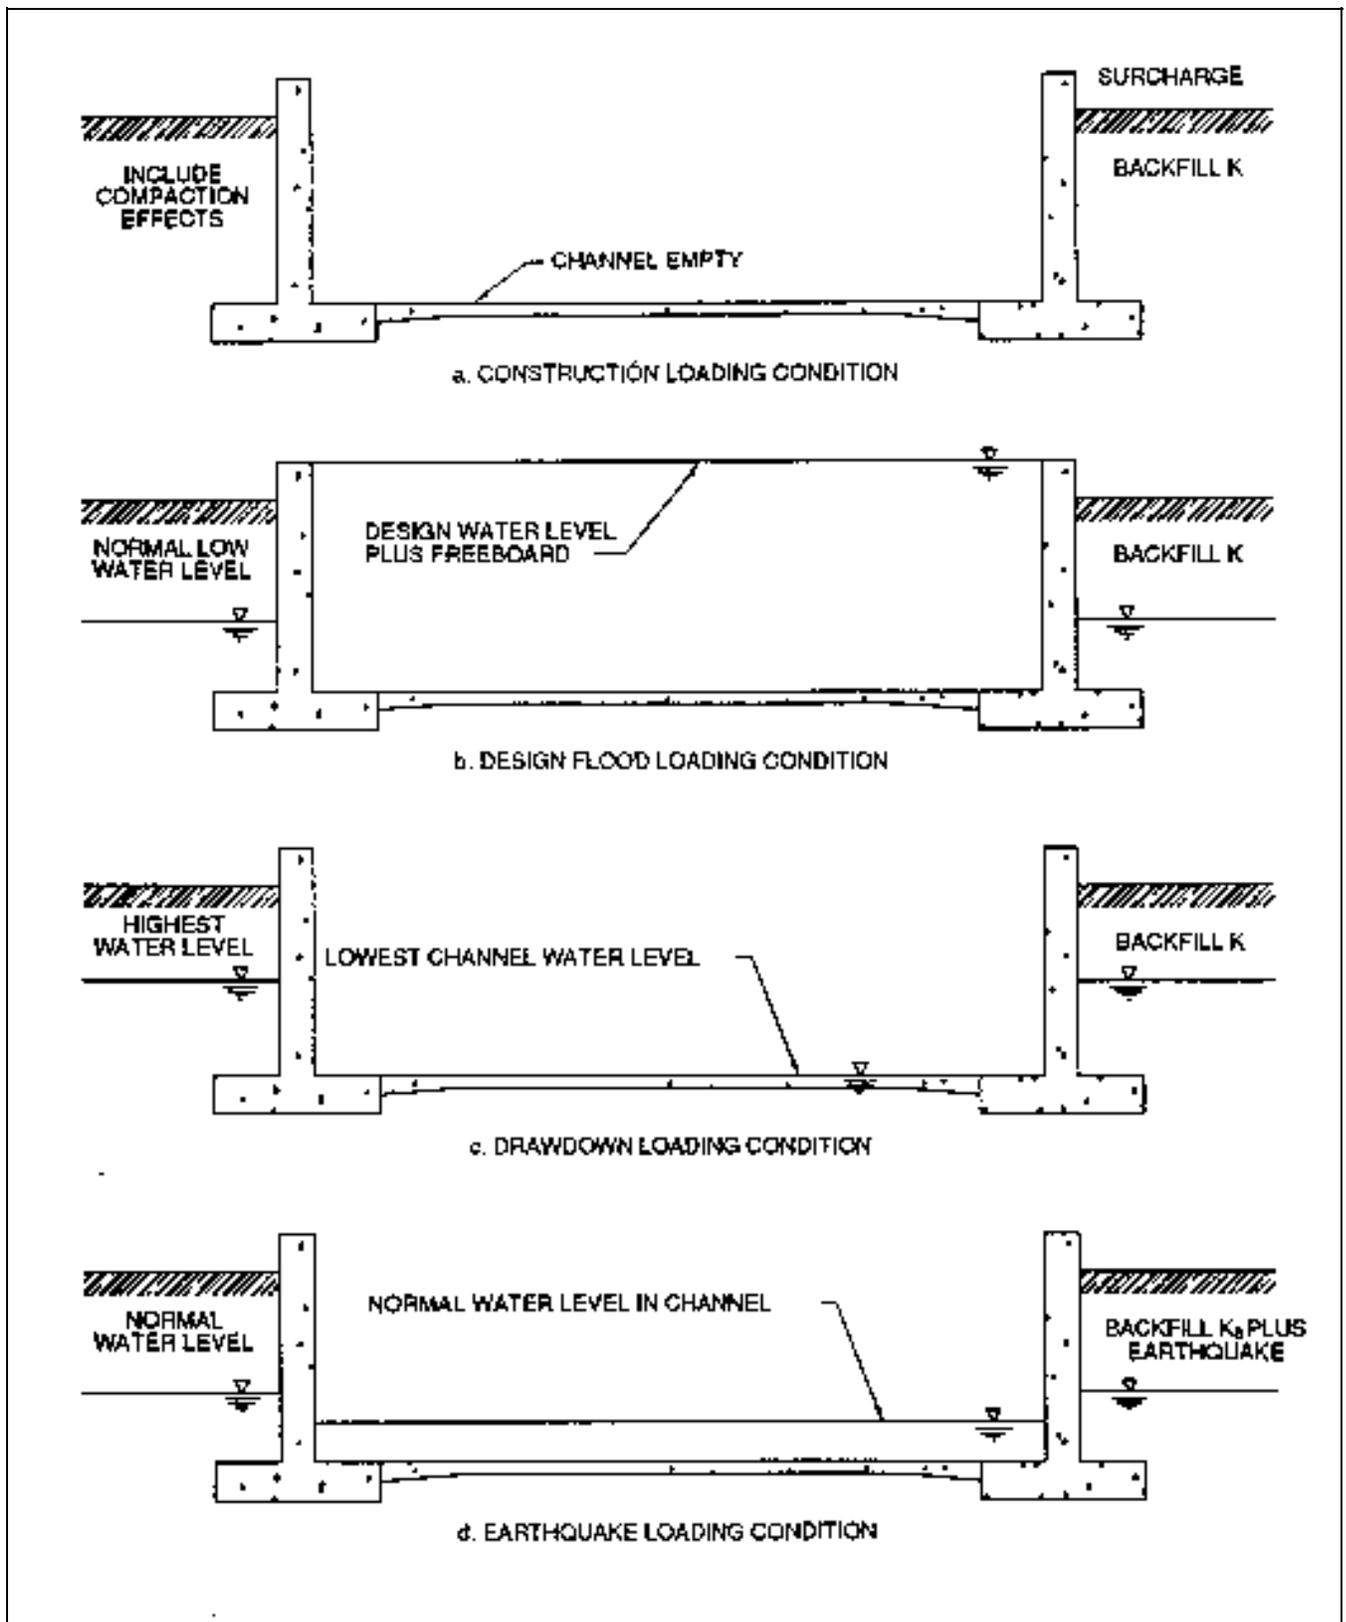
Loading conditions, rectangular channels with retaining walls
